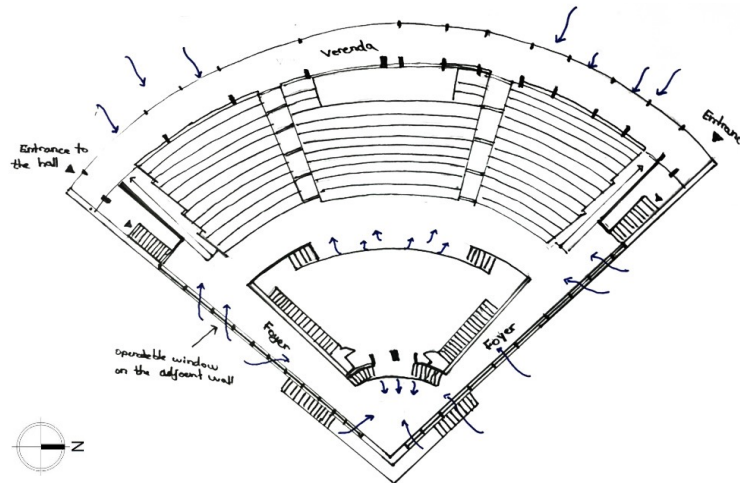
Diagram showing layout plan of Chaktomuk Conference Hall.
